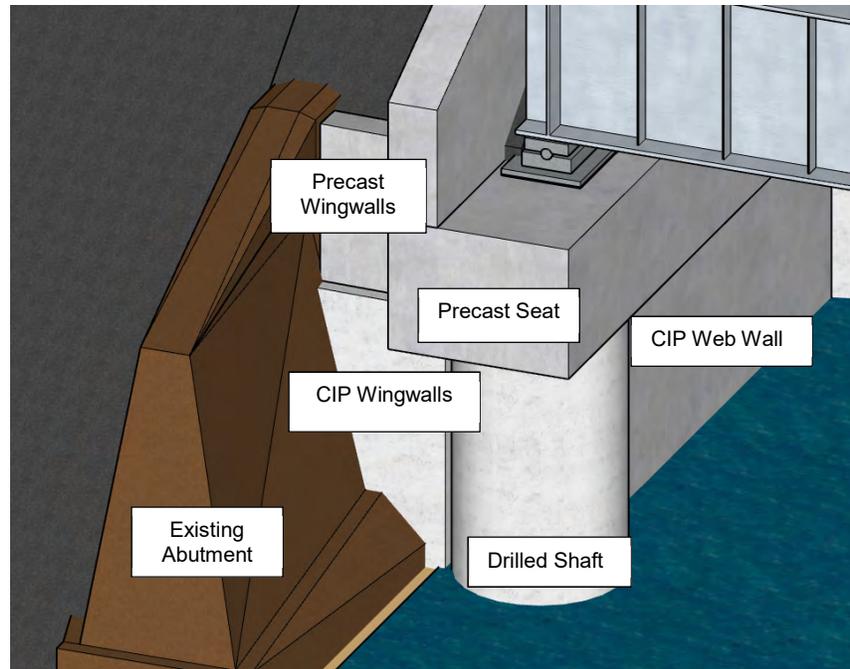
New Bridge Abutment adjacent to Existing Abutment
